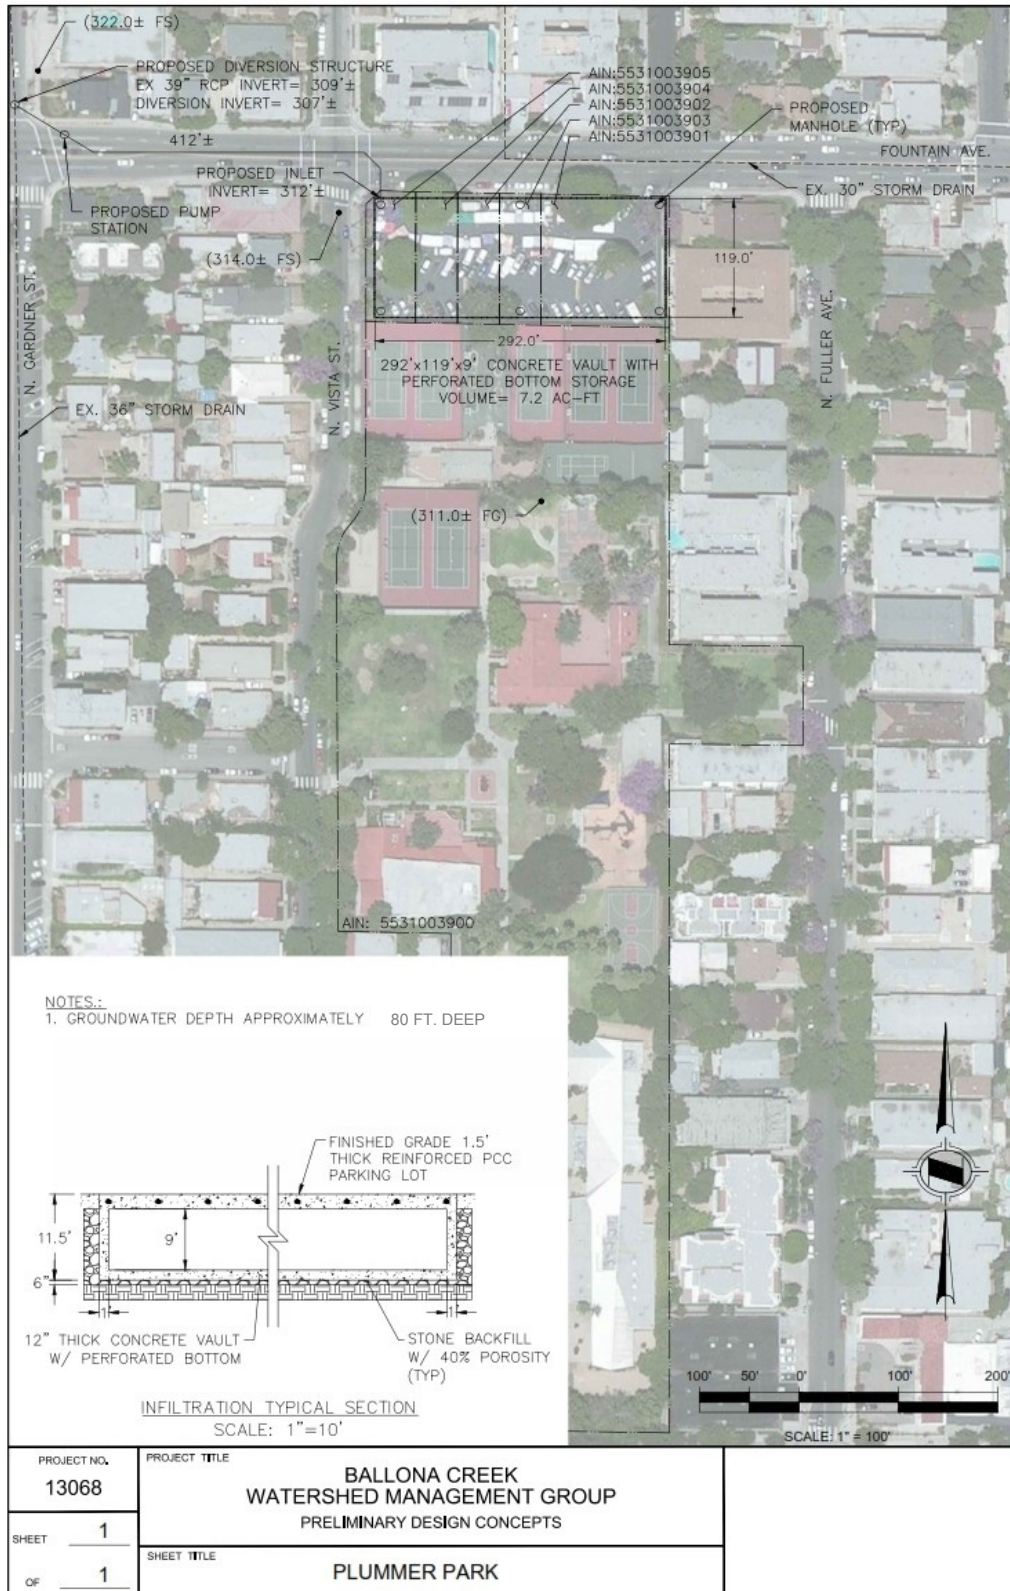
Plummer Park Subsurface Infiltration Site – Preliminary Design Concepts
